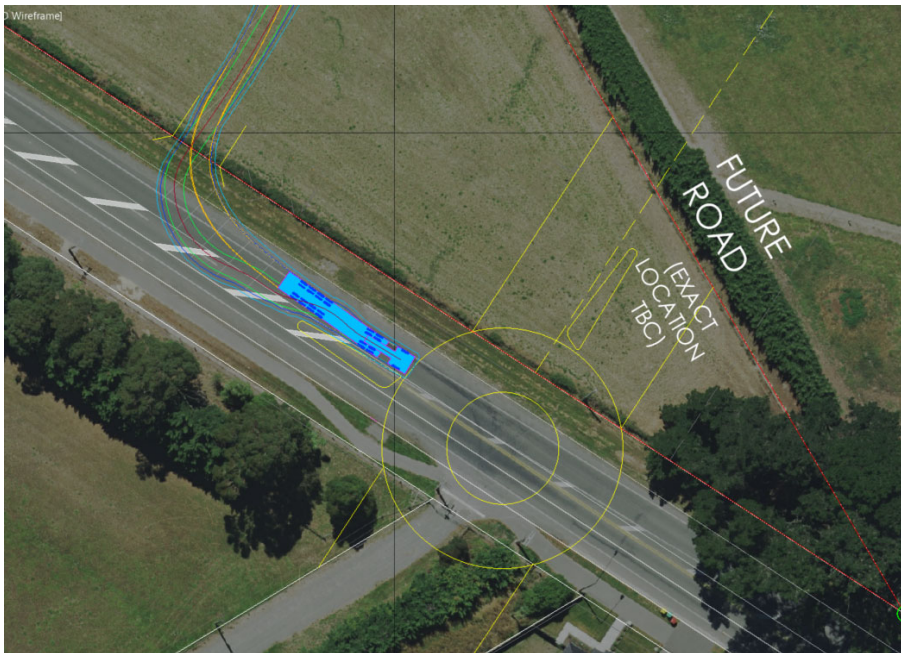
Adjustments to PAK'nSAVE Lincoln Rolleston Road Access
